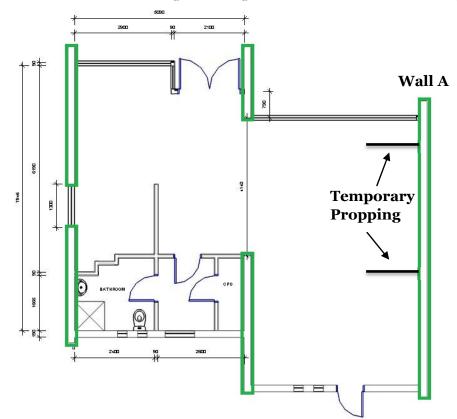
Walls used for bracing in the transverse direction Residents Lounge.
